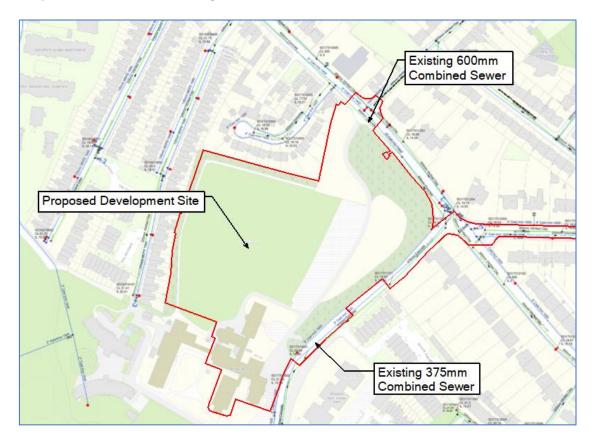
Extract from Irish Water's Network Plan (Site Boundary Indicative Only)
